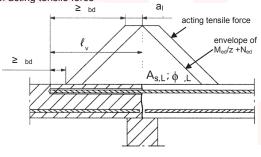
Overlapping joint at a foundation of a wall or column where the rebars are stressed in tension
